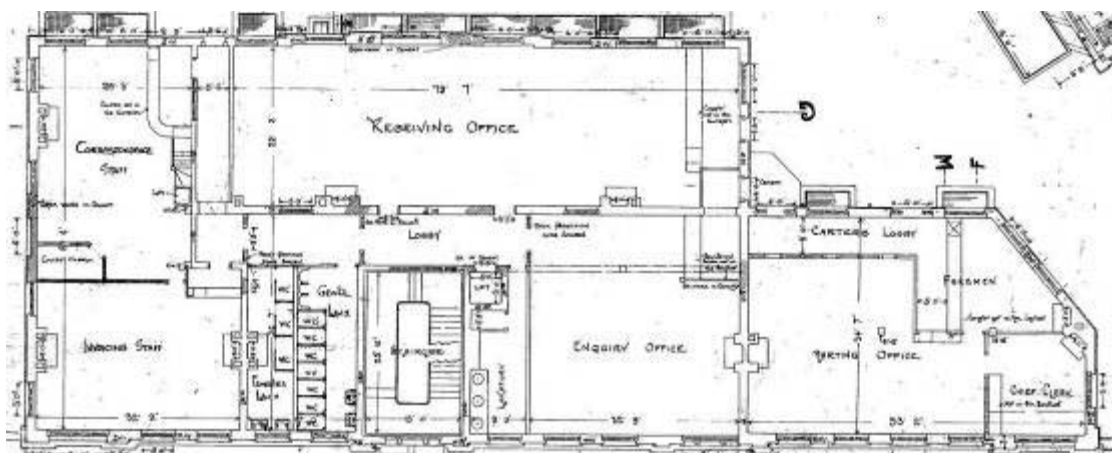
1904 Ground floor plan of Kings House (N is to the right)
